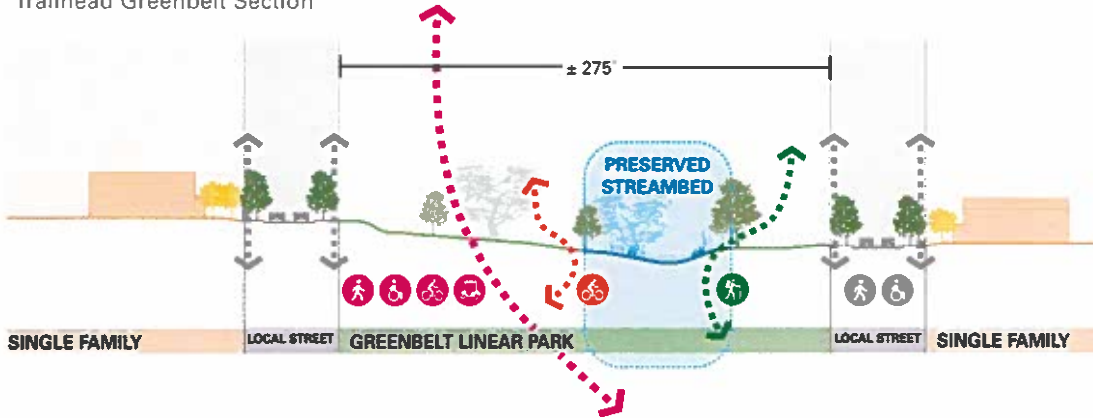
EXHIBIT F – OPEN SPACE AND TRAILS PLAN
